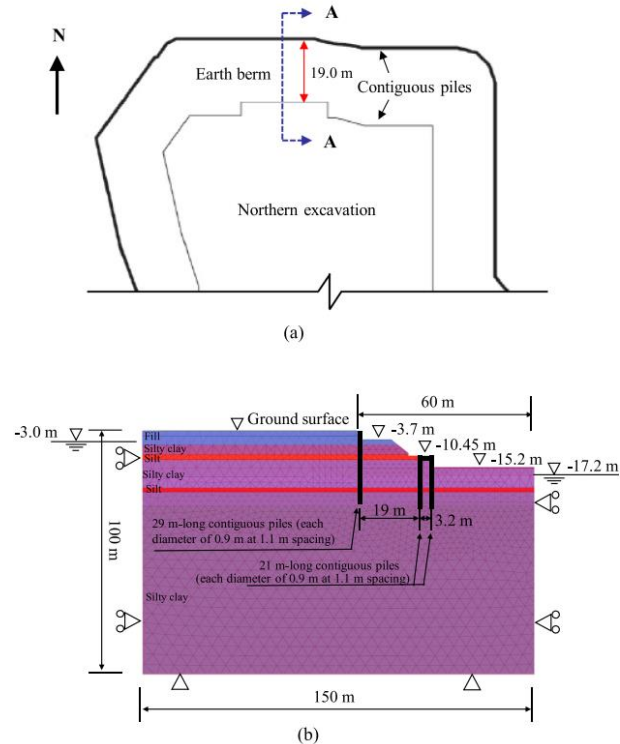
(a) Location of cross-section A-A (plan view) and (b) cross-section A-A of the excavation used in the design analysis.
